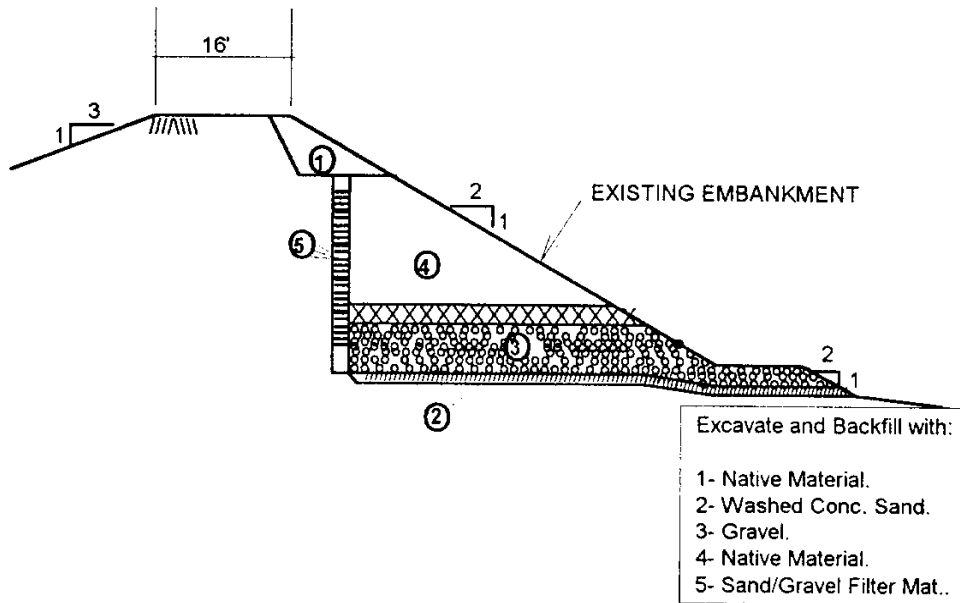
PIGEON PASS DAM, CHIMNEY DRAIN INSTALLATION
